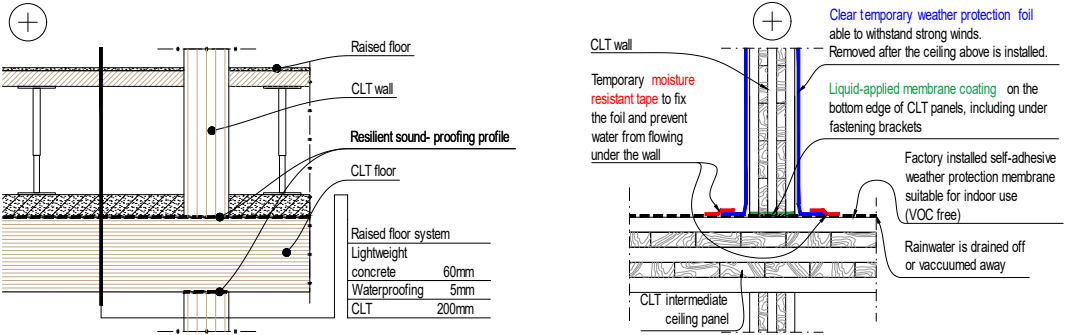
Design drawing (left) of the intermediate ceiling to intermediate wall connection and our proposal (right) of wetting mitigation practices.
